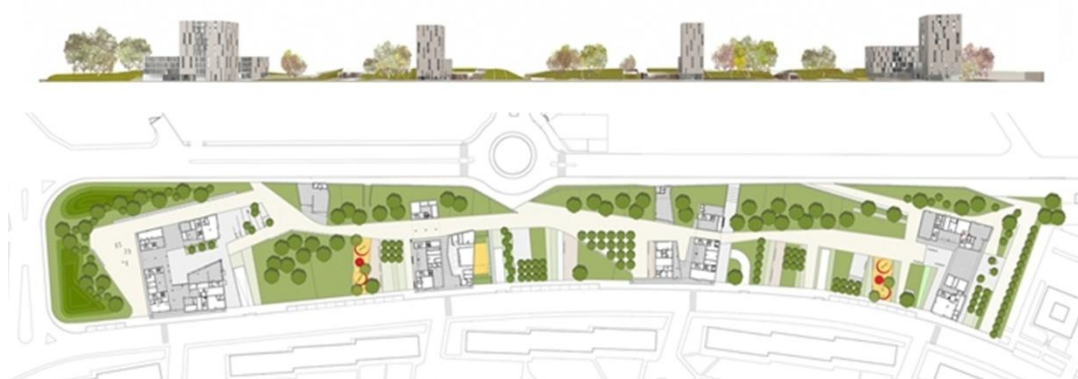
SITE ELEVATION SHOWING THE VARIATION OF HEIGHTS IN THE PARK
